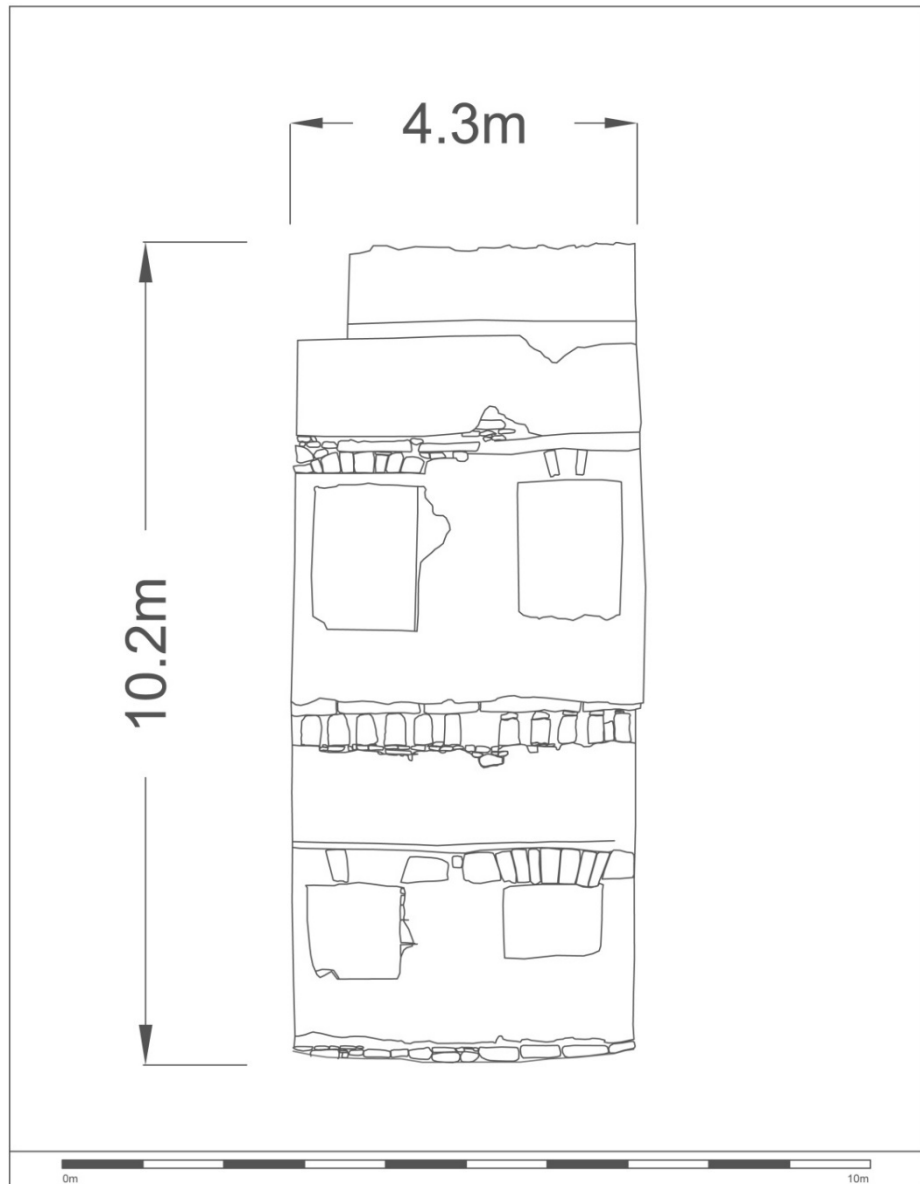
Internal elevation of the south-east wall of the signal tower at Inisheer Signal Station.
